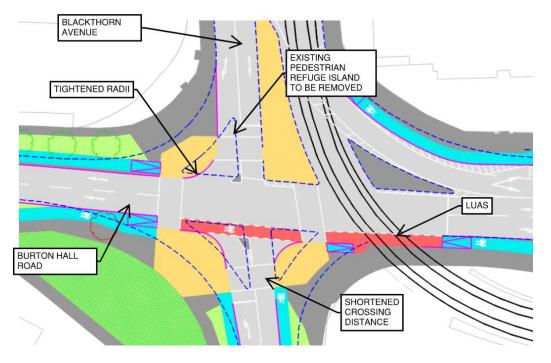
Burton Hall Road/Blackthorn Avenue Junction
